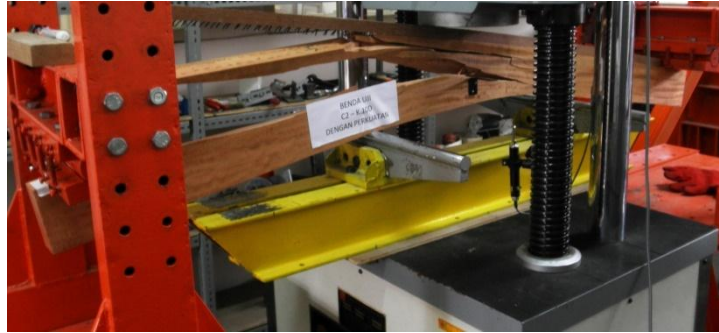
Tension failure on the main beam and nails pull-out MK-10D-2
